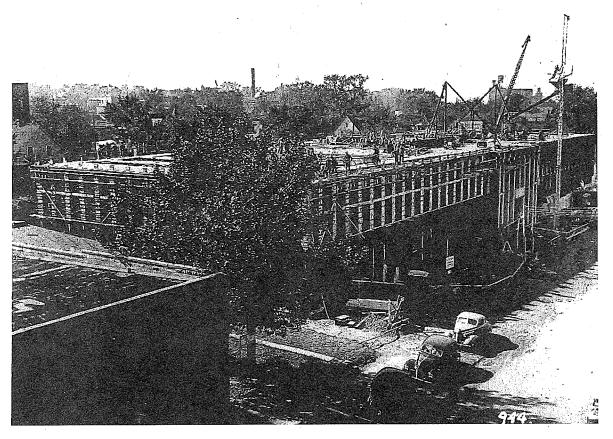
The 3M Administration Building under construction in 1939. (MHS photograph collection)
